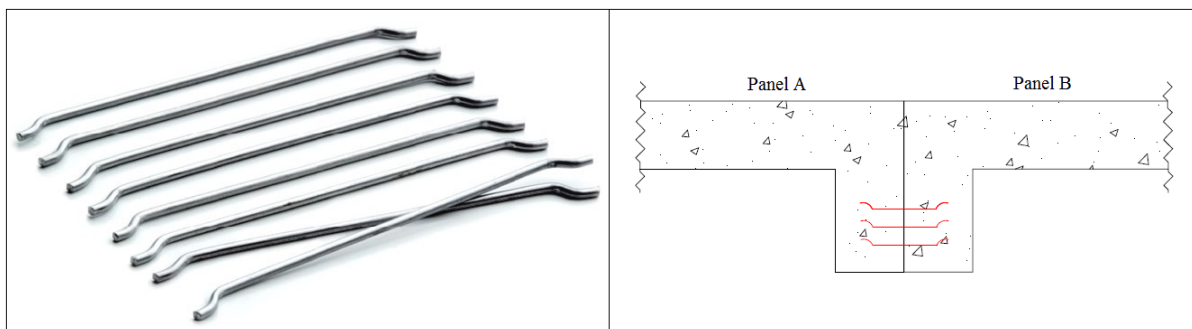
Connecting steel fibers and their orientation in panel-to-panel connections
